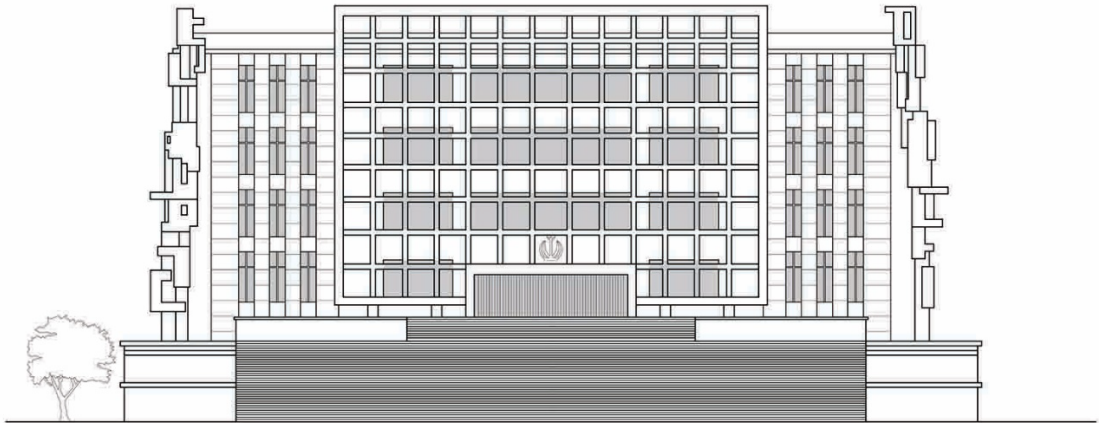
Openings on the main Façade. Old Senate, Tehran. Drawing by the Author (2020).
